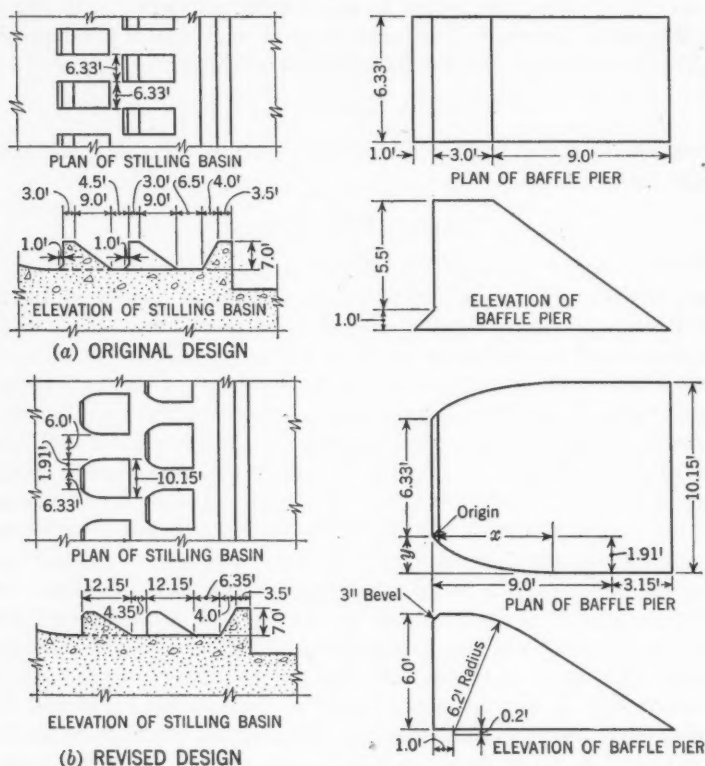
DIMENSIONS OF BAFFLE PIERS, BLUESTONE DAM
